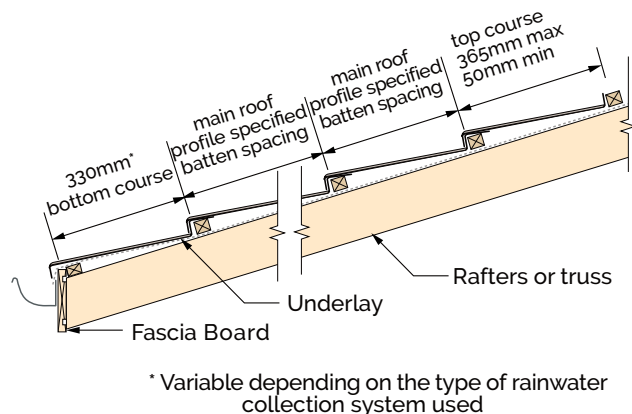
Rafter truss end-on view, batten spacing
